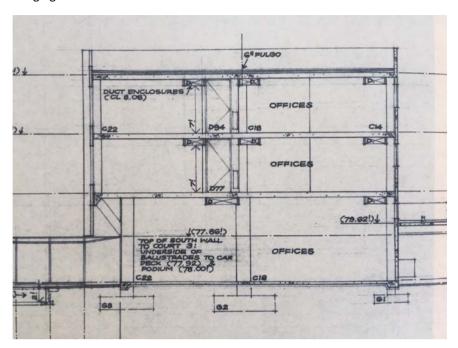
East West section through East Office wing showing 'Planks' hanging below level of first floor to provide sun screening to ground floor level floor to ceiling windows
